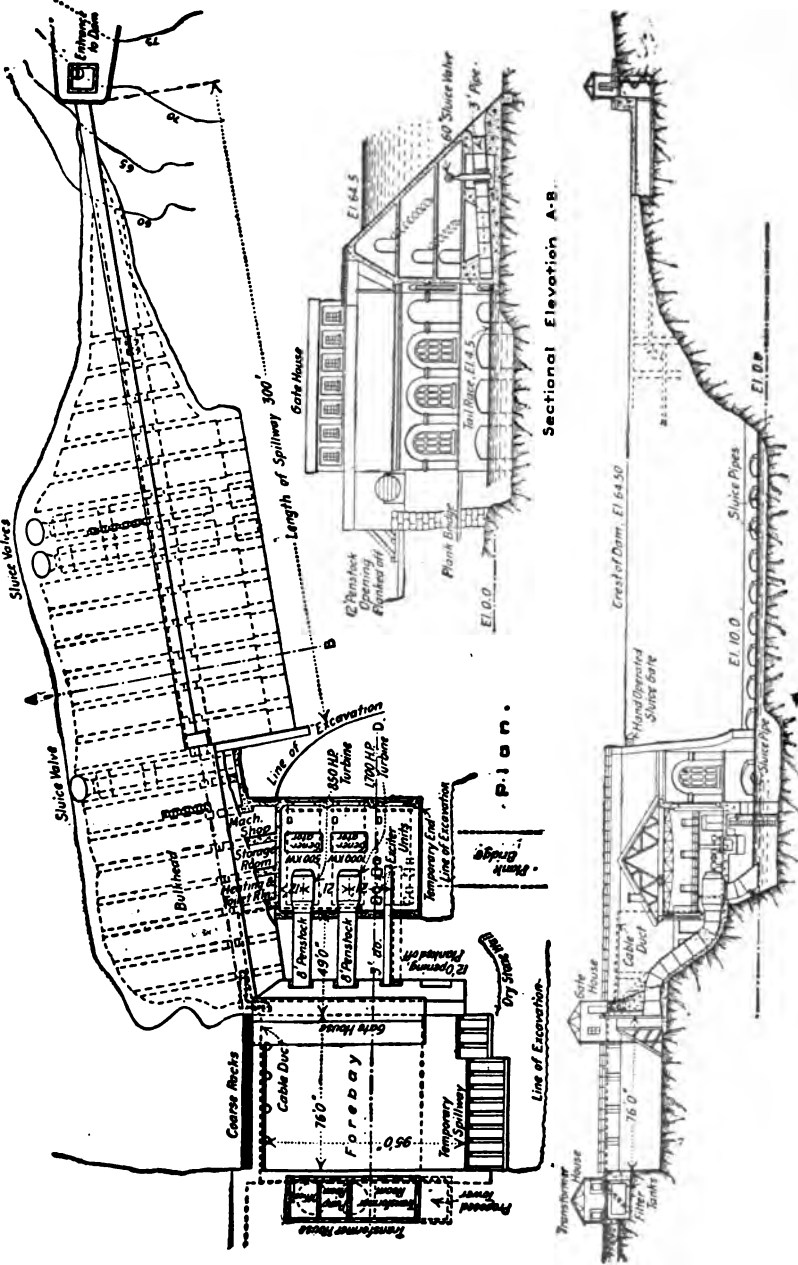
PLAN AND ELEVATION OF ELLSWORTH DAM.
